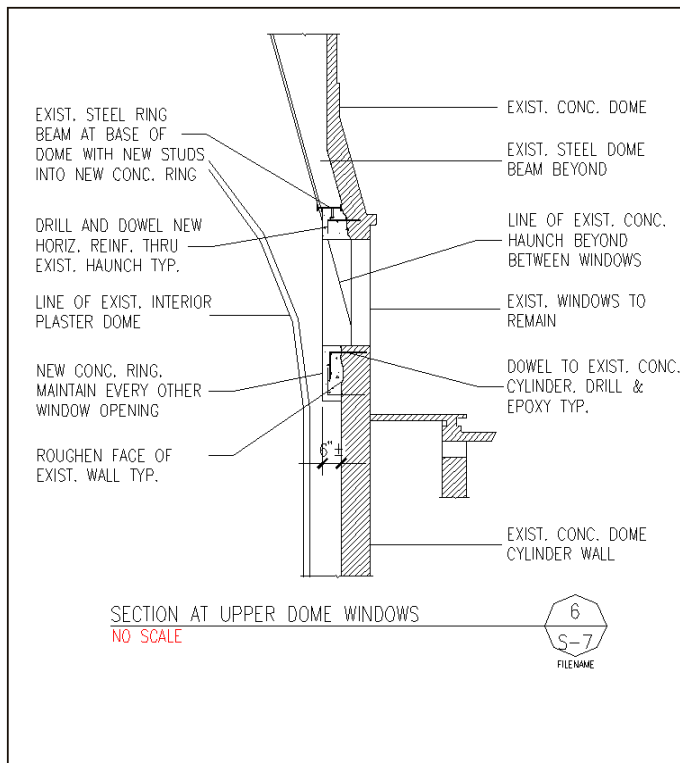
Schematic Detail for Reinforcing Upper Dome Windows
